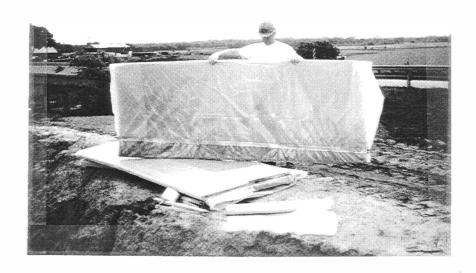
Wrapped Cardboard Spacer for Geotextile Reinforced Backfill, South Abutment, Bridge B
